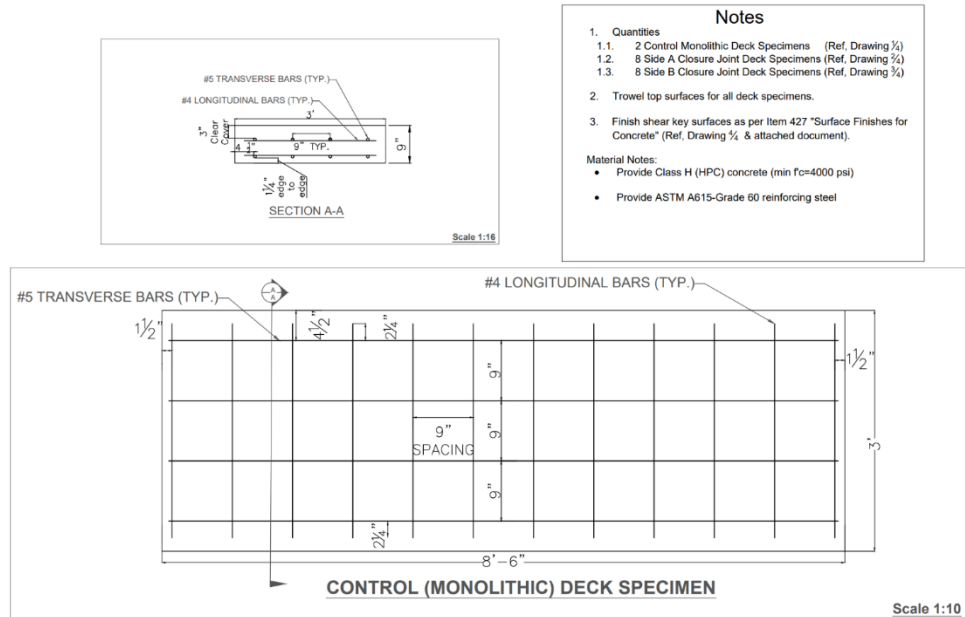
Drawing of Monolithic Control Specimen (Scale altered due to formatting)
